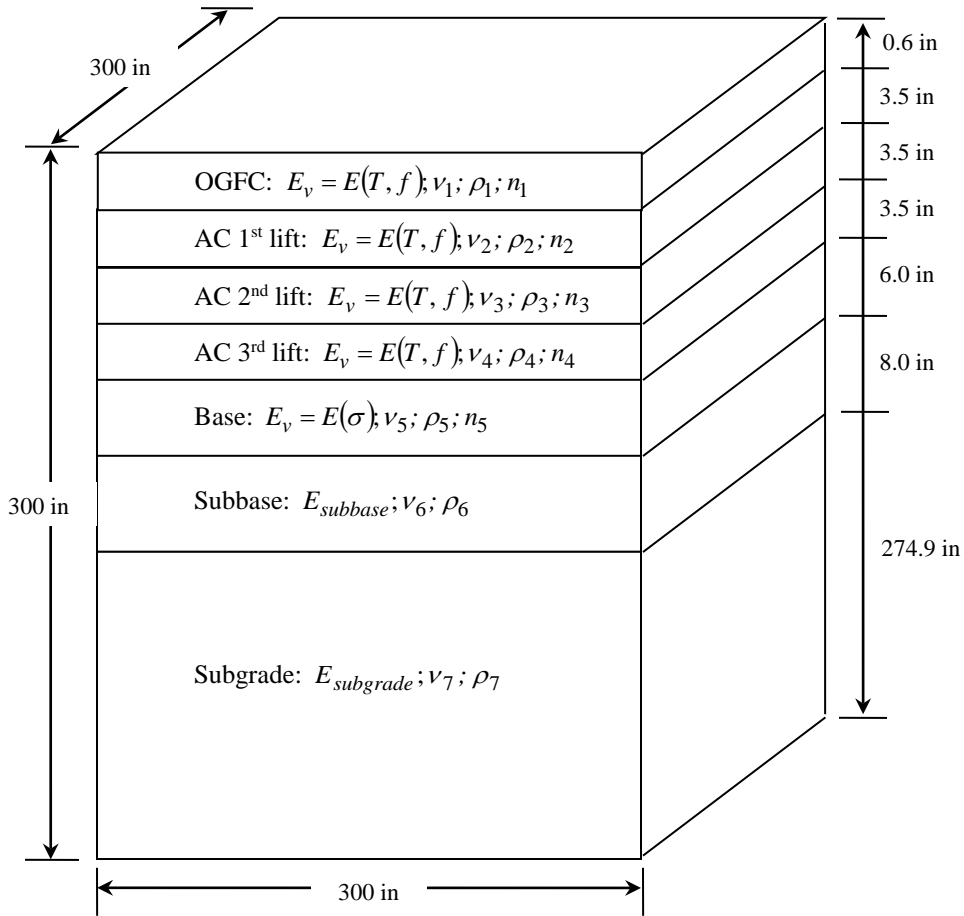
Multilayered structure of pavement section at MP 141, I-40
